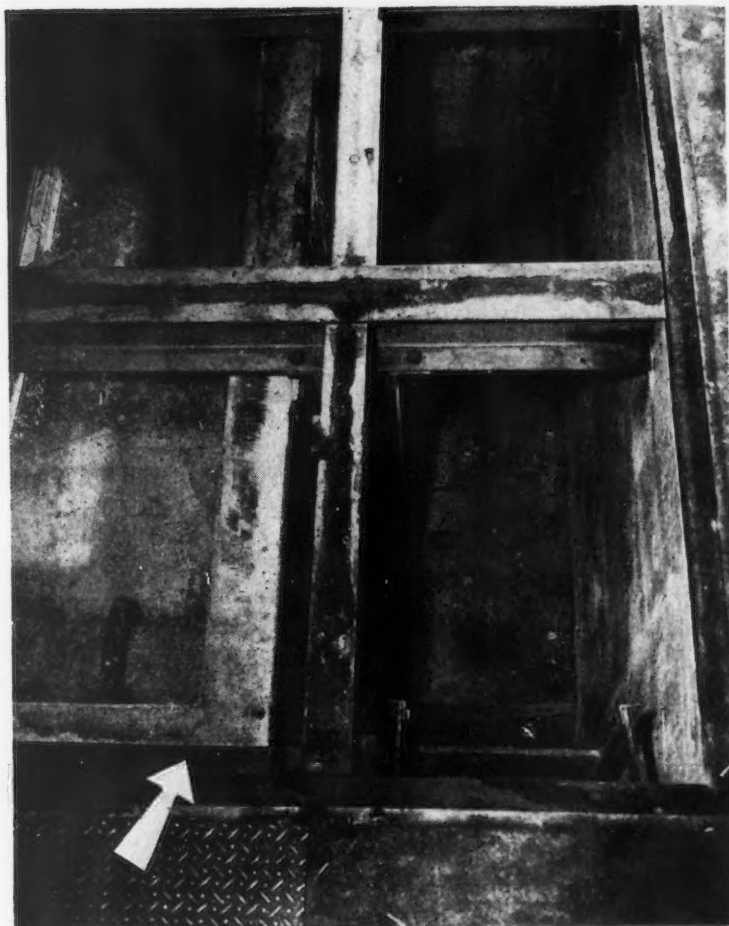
Details of the sand seal used to prevent sand from working into the pit and causing damage to the mountings.
